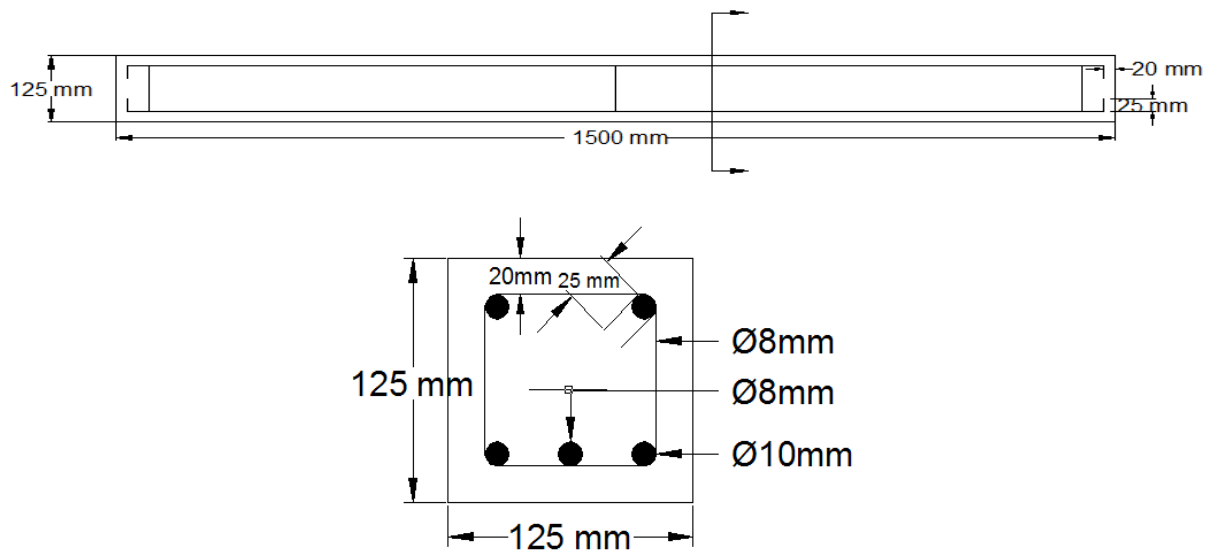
Dimensions and Detailing of Shear Control Beam
